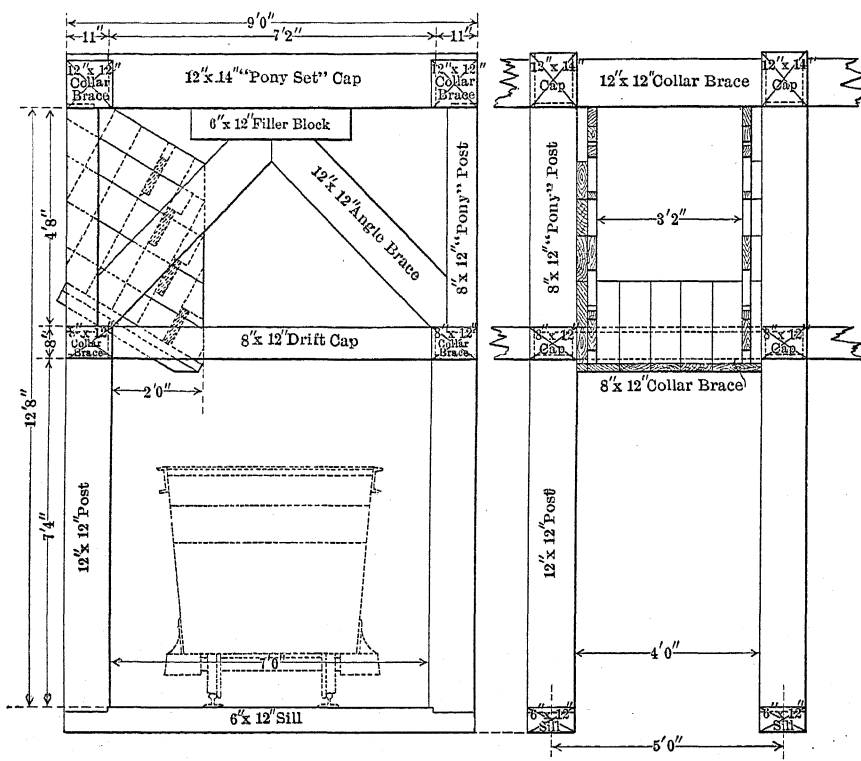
DRIFT TIMBERING FOR SUB-LEVEL, MOTOR-HAULAGE SYSTEM OF UNDERGROUND MINING.
